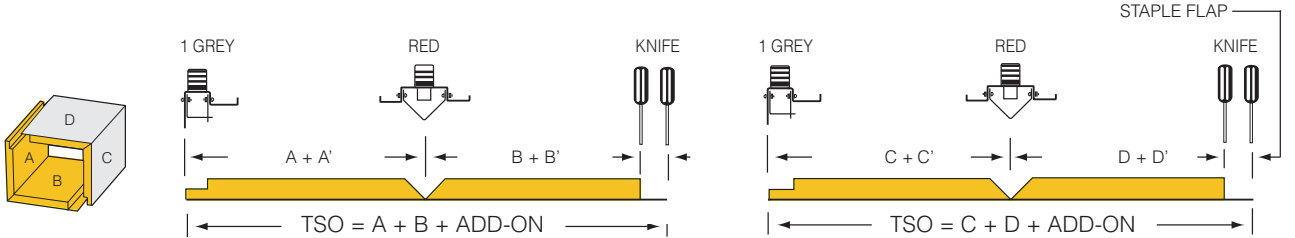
Fabrication – Two-Piece L-Style Duct
